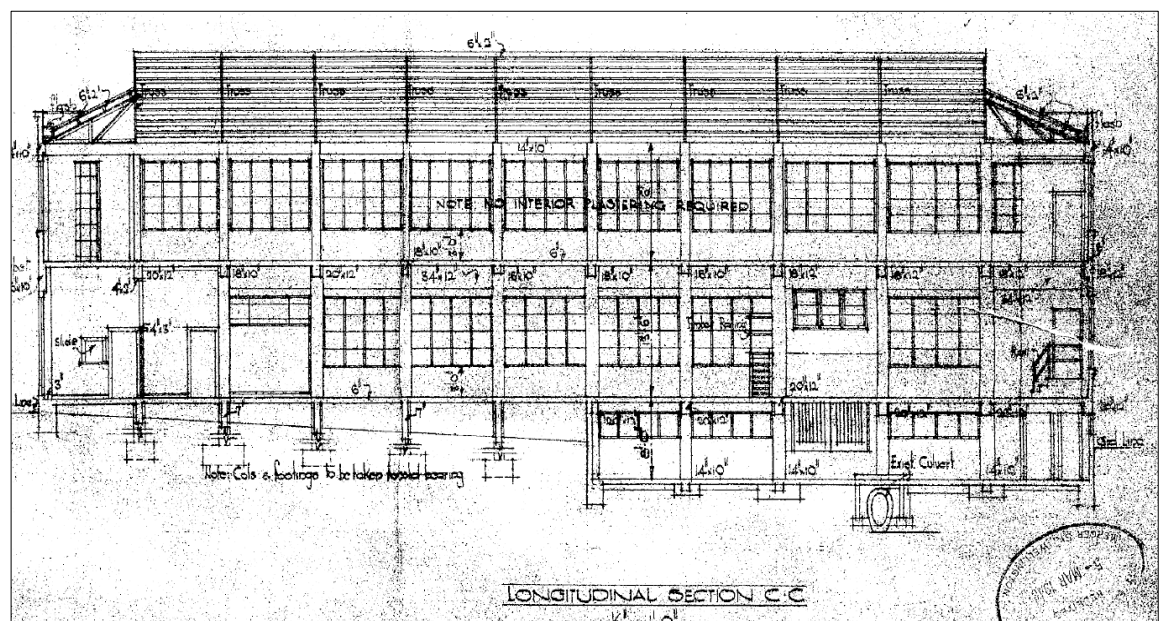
Bradley's Building Longitudinal Section C-C showing depth of basement (March 1946). Source: WC Archives 00056:320:B25050
